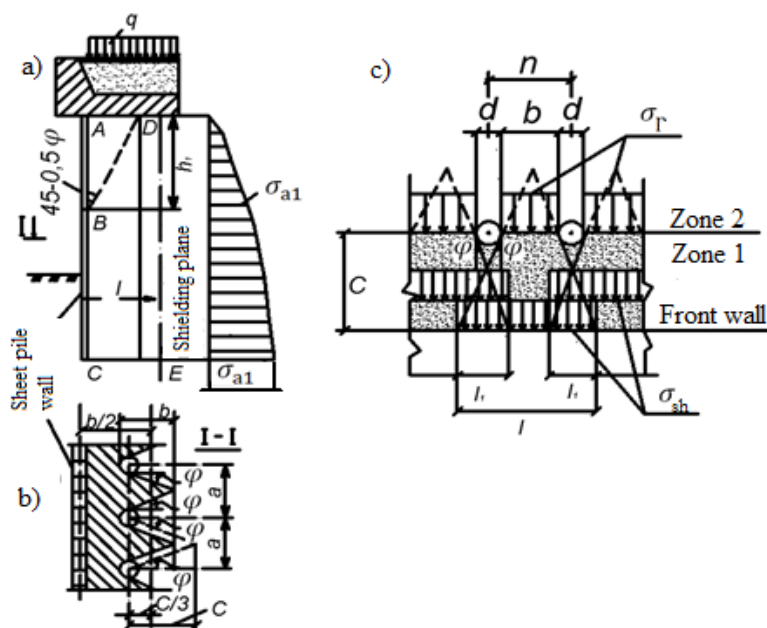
Composition schemes of diagrams of silage ground pressure on the front wall (a) and (b) additional shielding load pressure behind pile row (c)
